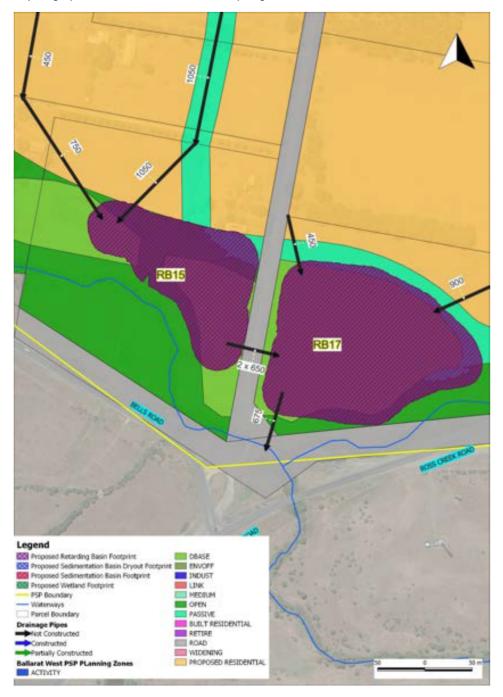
RETARDING BASIN 17 CONCEPT LAYOUT
